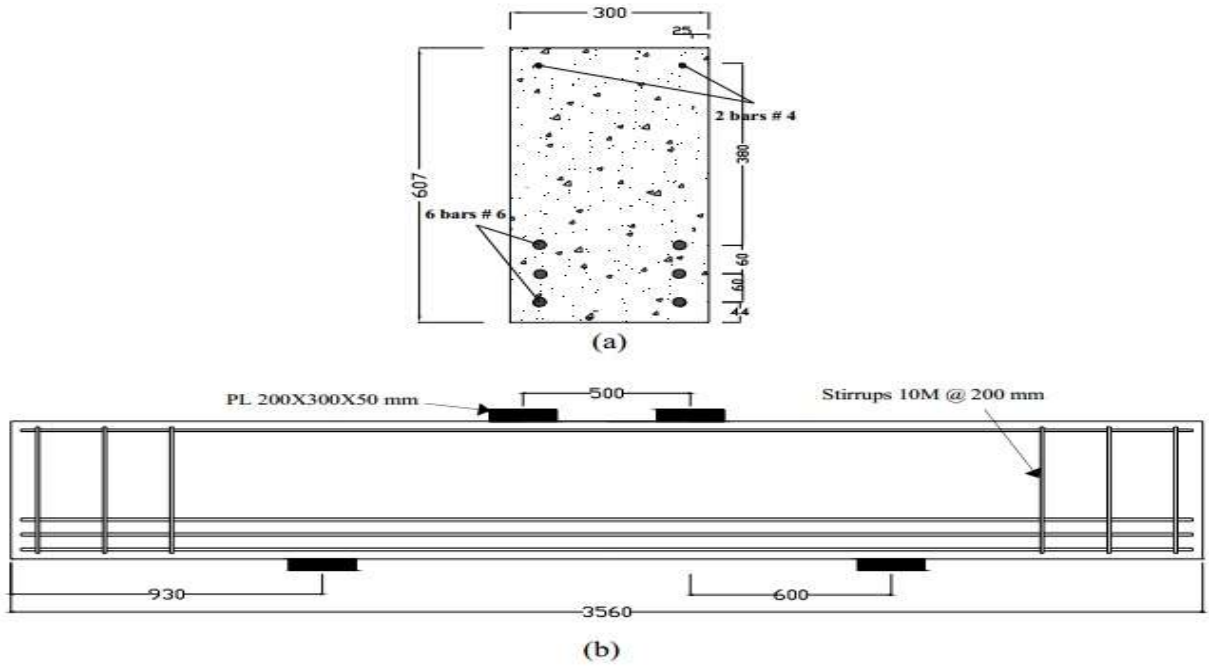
4: Beam MS3-2(a) Cross Section (b) Elevation
